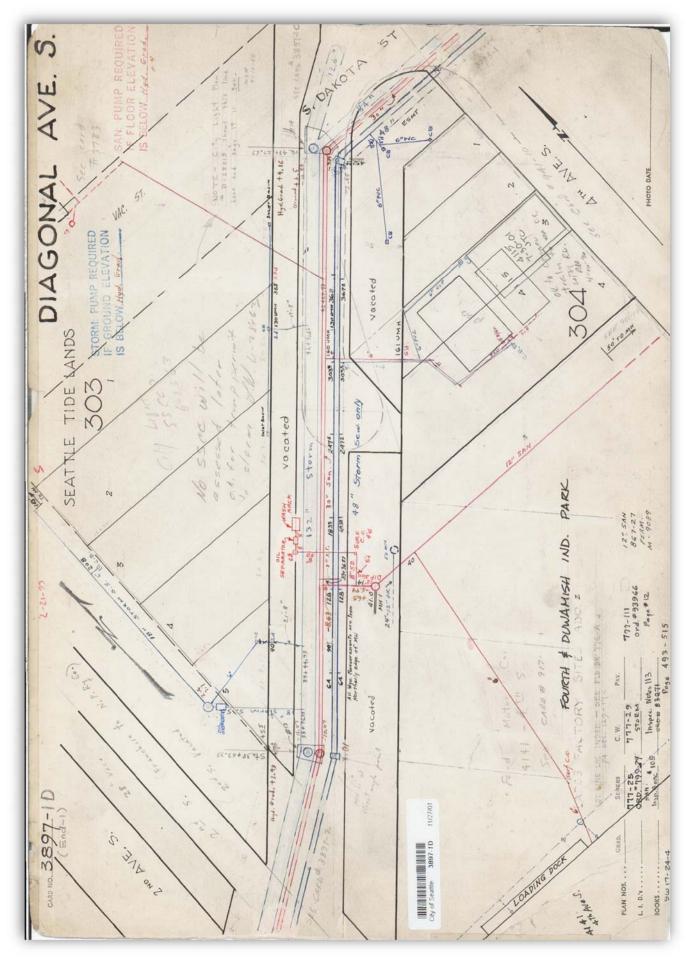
Storm drain and sewer map for Diagonal Avenue South.
